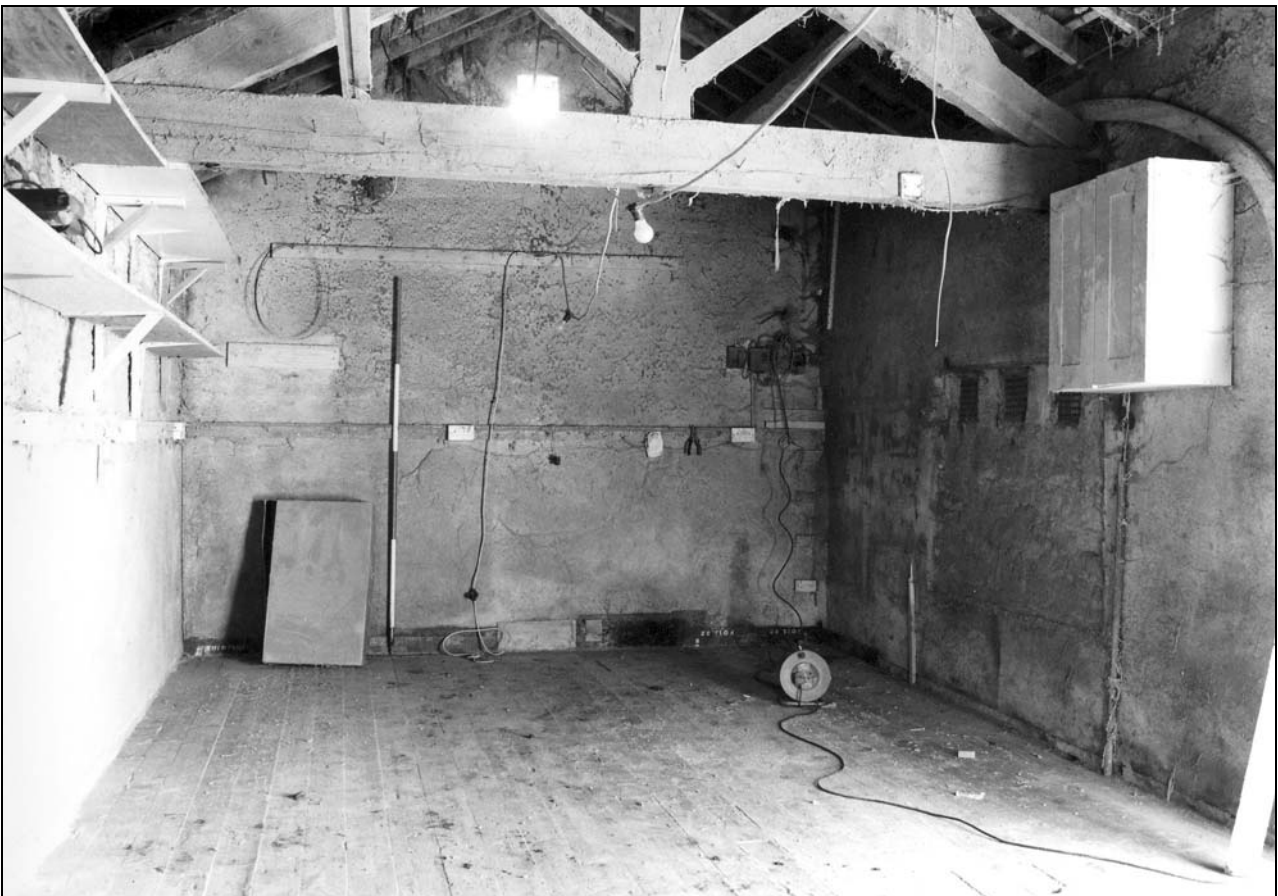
Building 1: upper ground floor room, from the north (film 3, frame 4)
